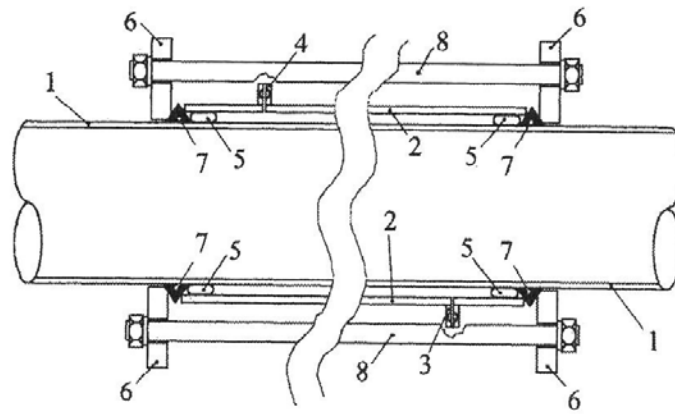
Method of pipeline defect repair with the use of folded sleeve and tightening flanges, pat. # 72840
